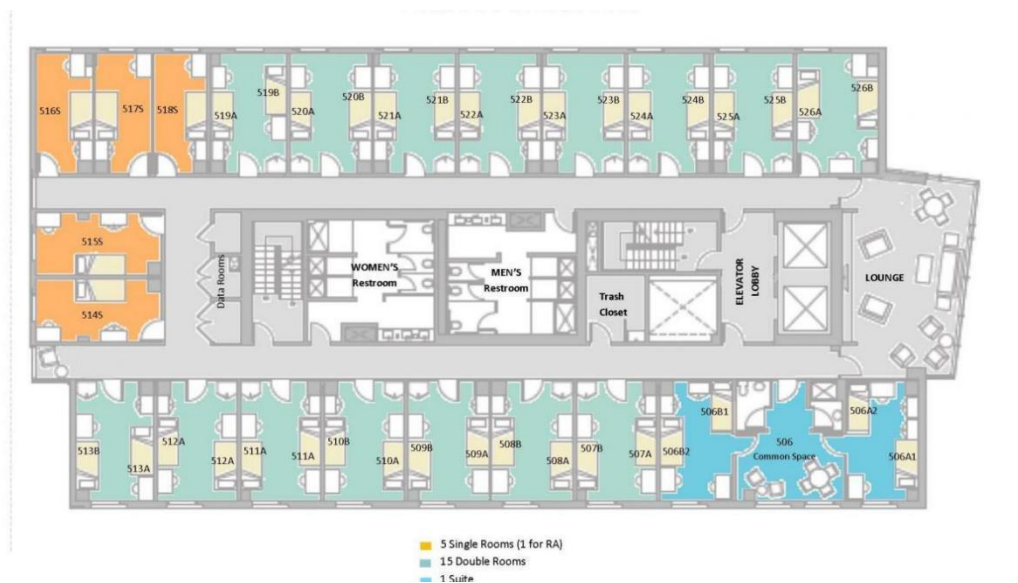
Dormitory floor plan (Source: Ditec (ditec-dus.de))
